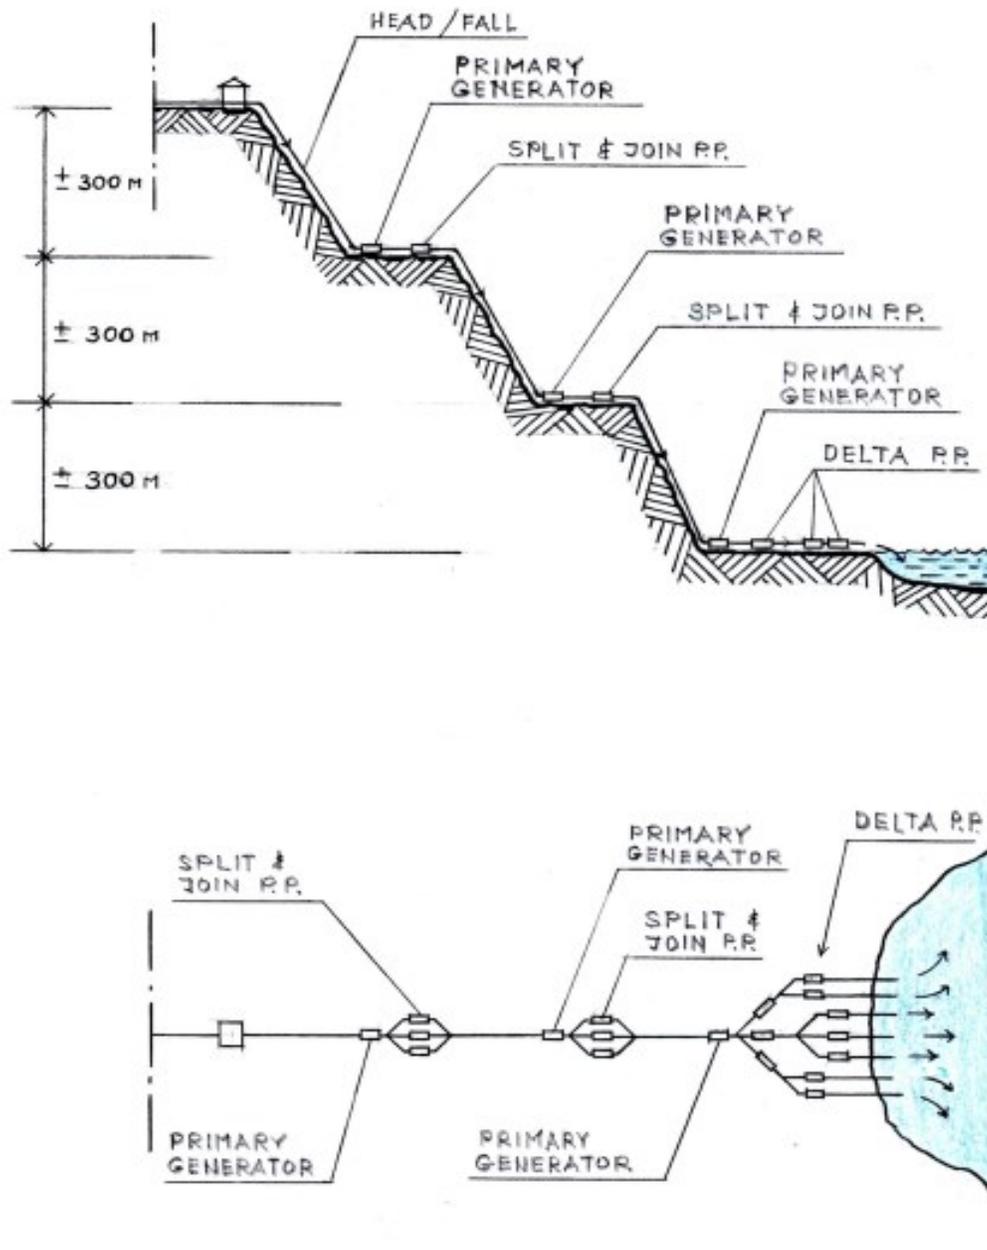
Plain and Cross-sectional View of the final downhill route
